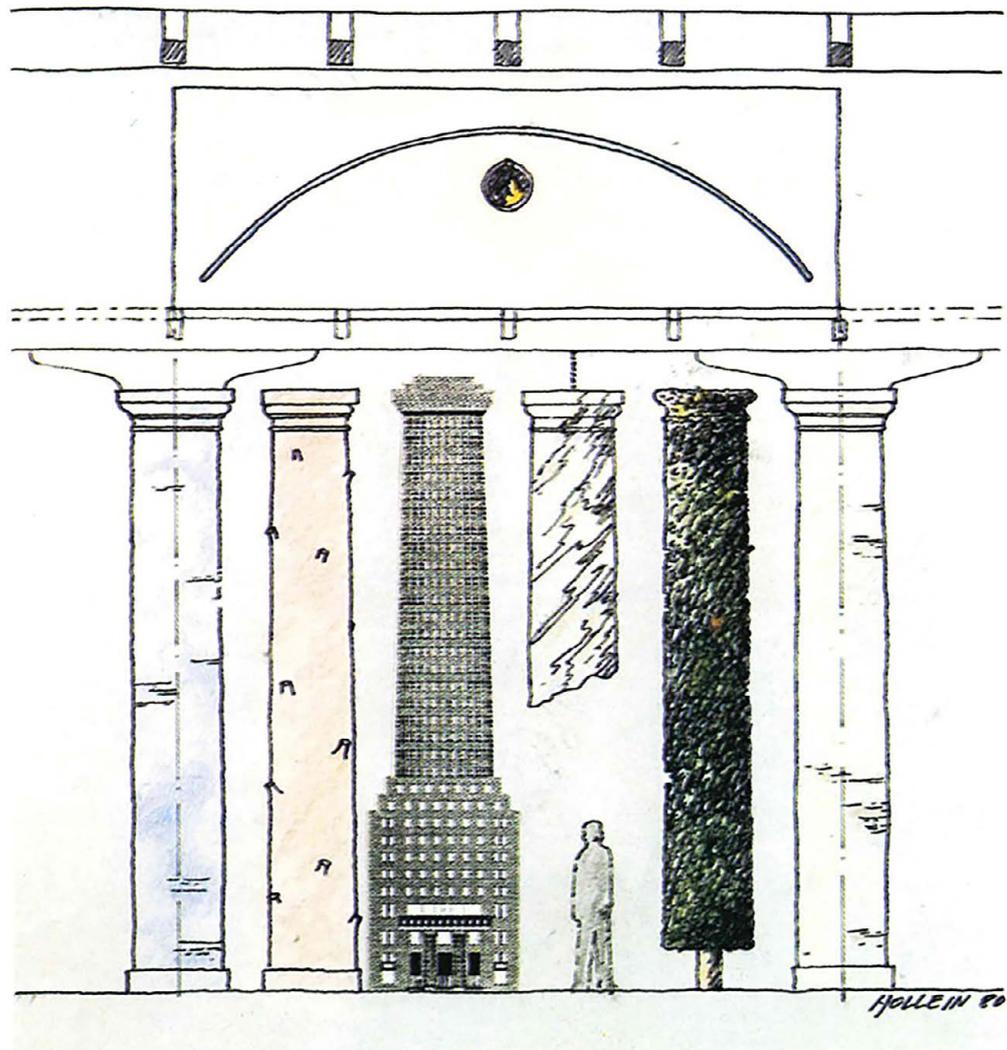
Hans Hollein, design of the façade for the *Strada Novissima*, 1980 (source: www.hollein.com).
